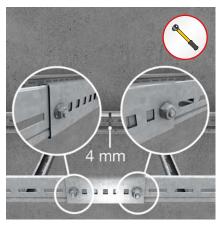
left: Fixed bearing (KLS 8x16); right: loose bearing (FRSV, SEMSS); Gap dimension 4 mm, tightening torque hand-tight (max. 4 Nm).
